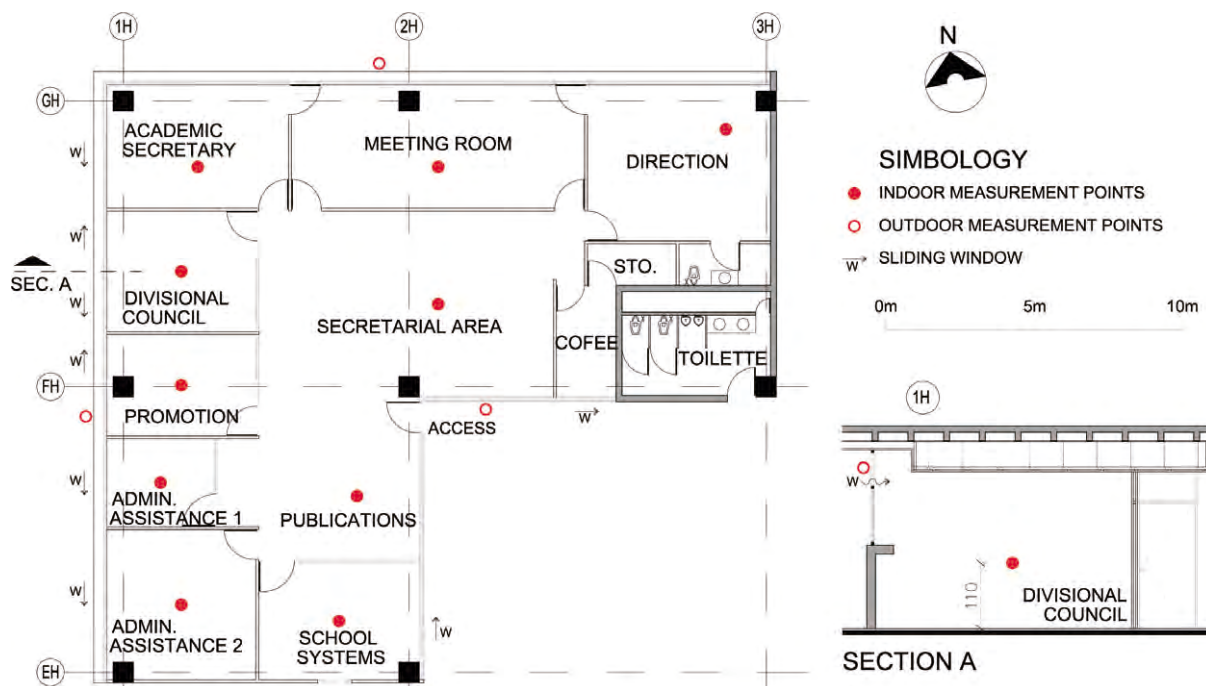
Architectural plan, offices. UAM-Azacapatzalco
